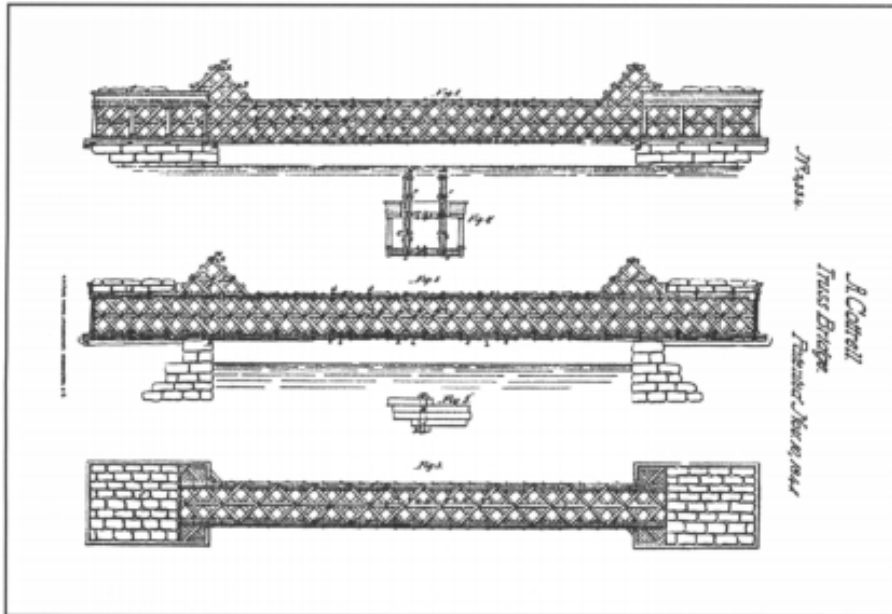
Patent no. 2,334 awarded to Albert Cottrell in 1841. Supposedly he built such a bridge in Maryland and began one in Saint John, New Brunswick, but stopped with 300 feet of the 500-foot crossing remaining to be erected. United States Patent Office.
